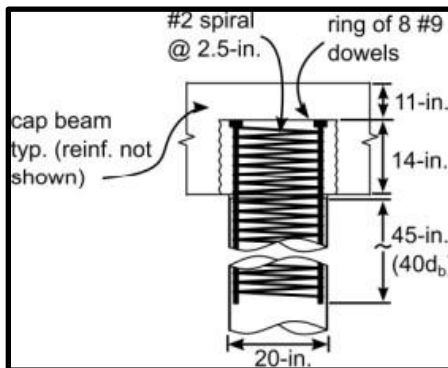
Caltrans: Annular ring detail for pile to bent cap connection with headed bars
